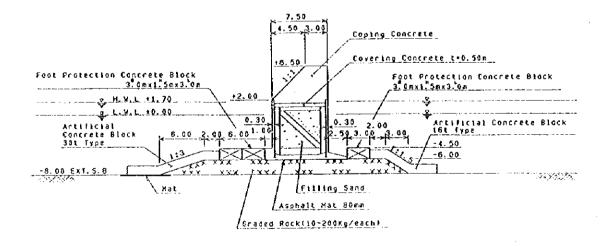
(6) Typical Cross Section of Breakwater 4 (Hybrid Caisson)
